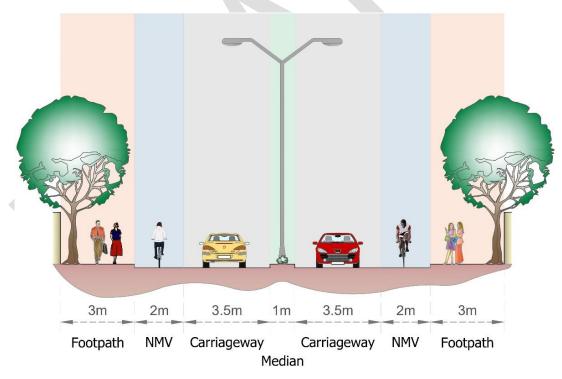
Typical Cross Section of 18m Wide Road with Bicycle Tracks
